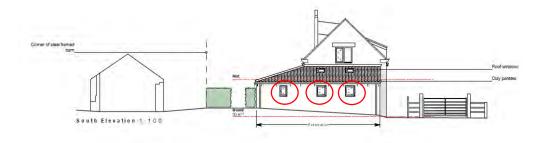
The south elevation of the extension reflects the overall scale, proportion of the original building.
